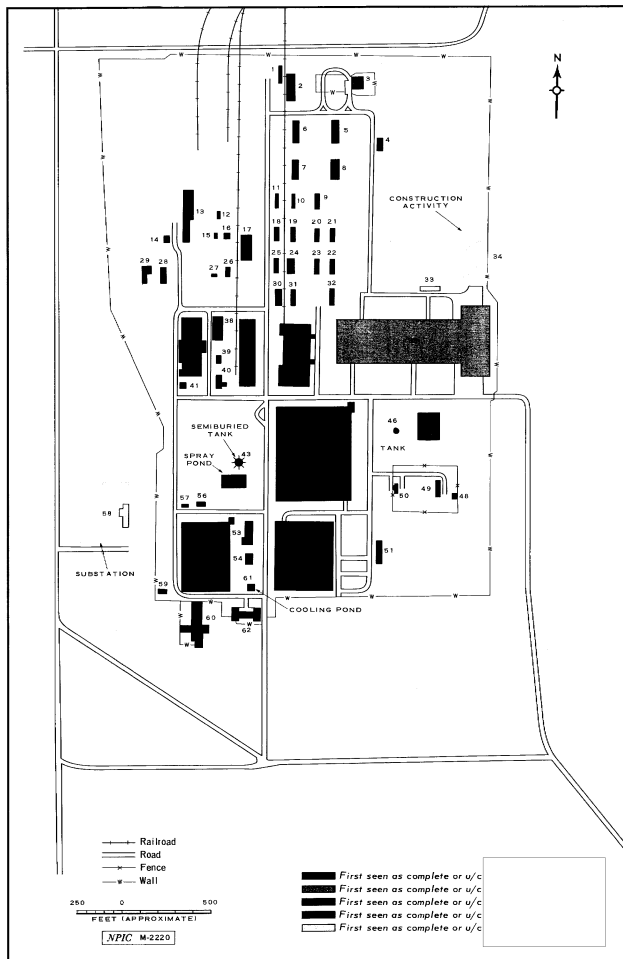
LAYOUT OF NORTHWEST PLANT AREA.
